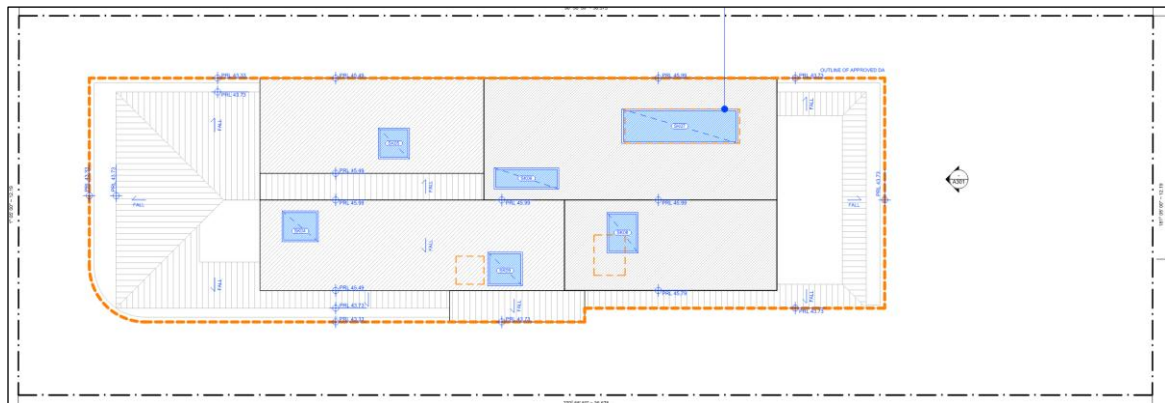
Proposed roof plan (source: Common Office, dated 5/11/2025)
